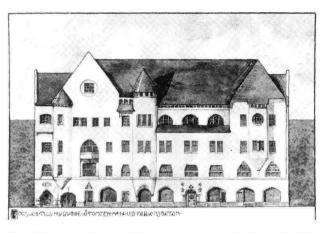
Design for a building at Fabianinkatu 14, Helsinki, 1905. (Original and photo SRM).
